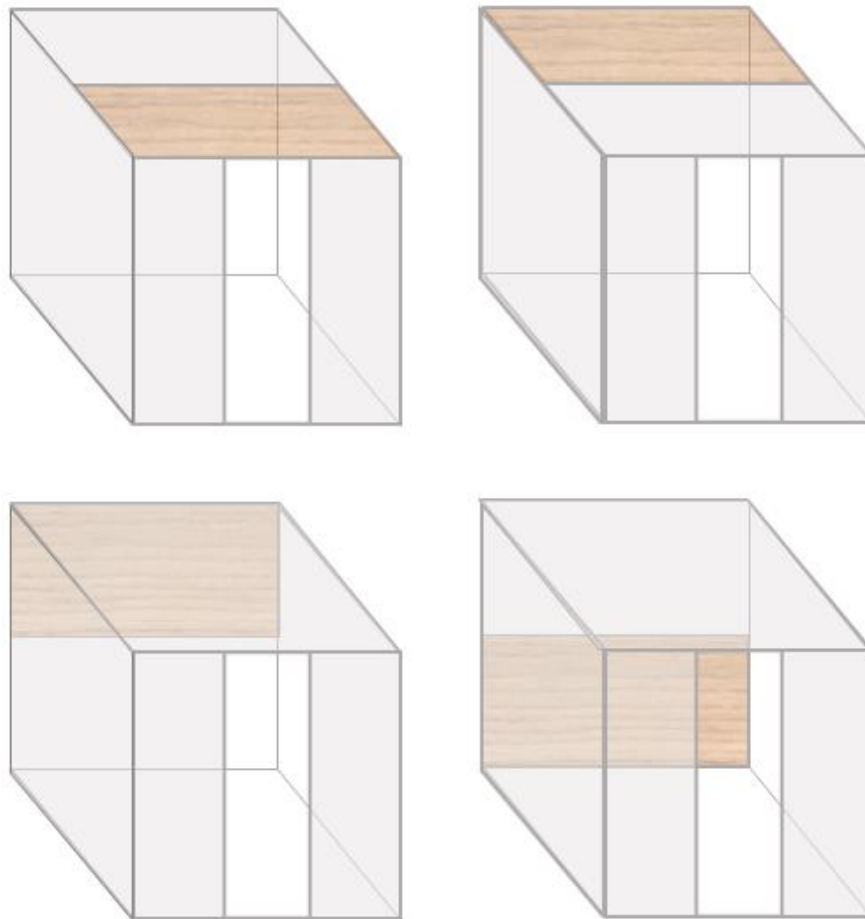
Half exposed timber surfaces in all the experimented configurations. Top row shows the exposed ceiling timber; bottom row the exposed back wall timber.
